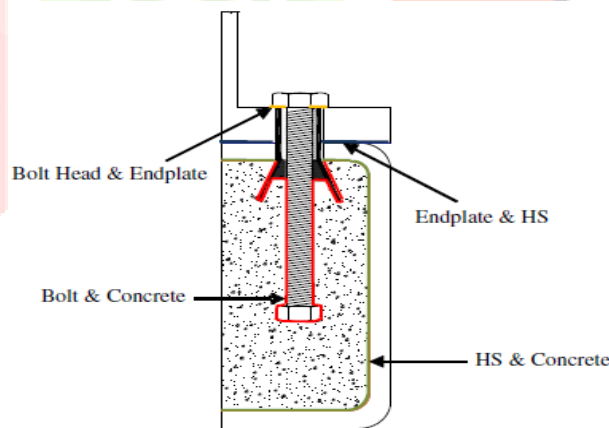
Extended Hollo-Bolt in Concrete Filled Steel Tube - (Tizani)
